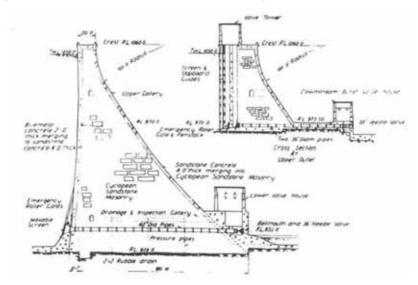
Cross-section of the Avon Dam Wall (Source: WaterNSW, 2015a)
